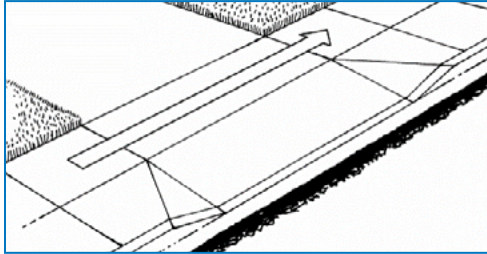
A sidewalk at the back of a driveway creates a level pedestrian route, meeting the proposed ADA cross slope requirement of 2 percent or less. Credit: US Access Board
